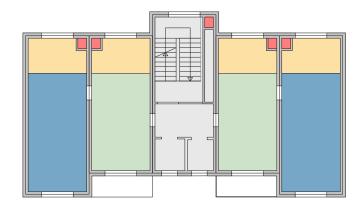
Plan form of assembly of 3 modules manufactured in 2:1 ratio
